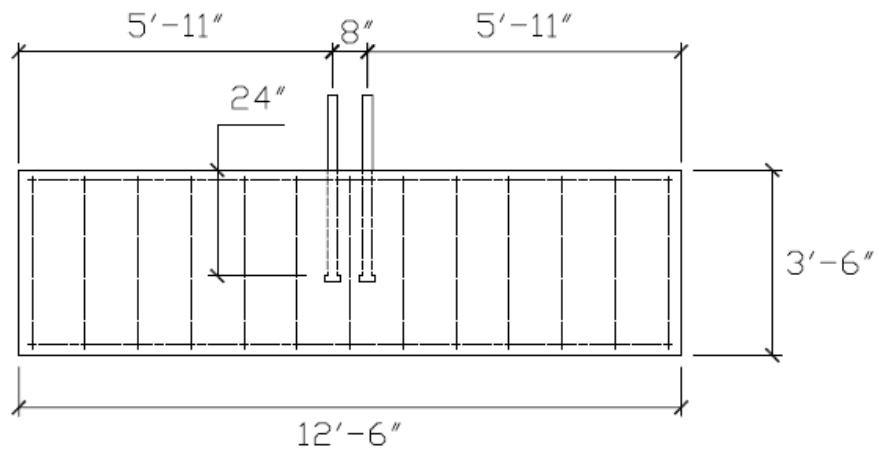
Elevation view of Specimens 8 and 9 (Specimen 8 had a smaller head than Specimen 9)
